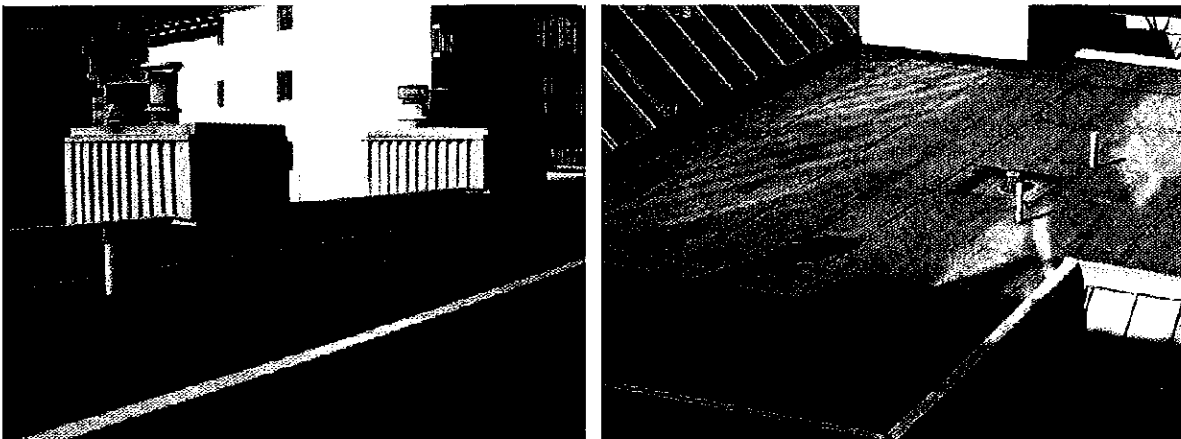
New flat roof system on top level (left). Flat roof for the building structure on the main level (right).
